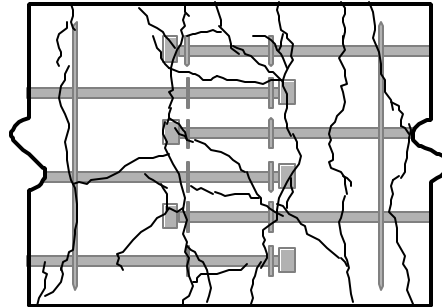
Crack development in a typical hairpin confined lap splice test (specimen LS-08-04.04-12-10(N)-1-H0.6) (continued)
